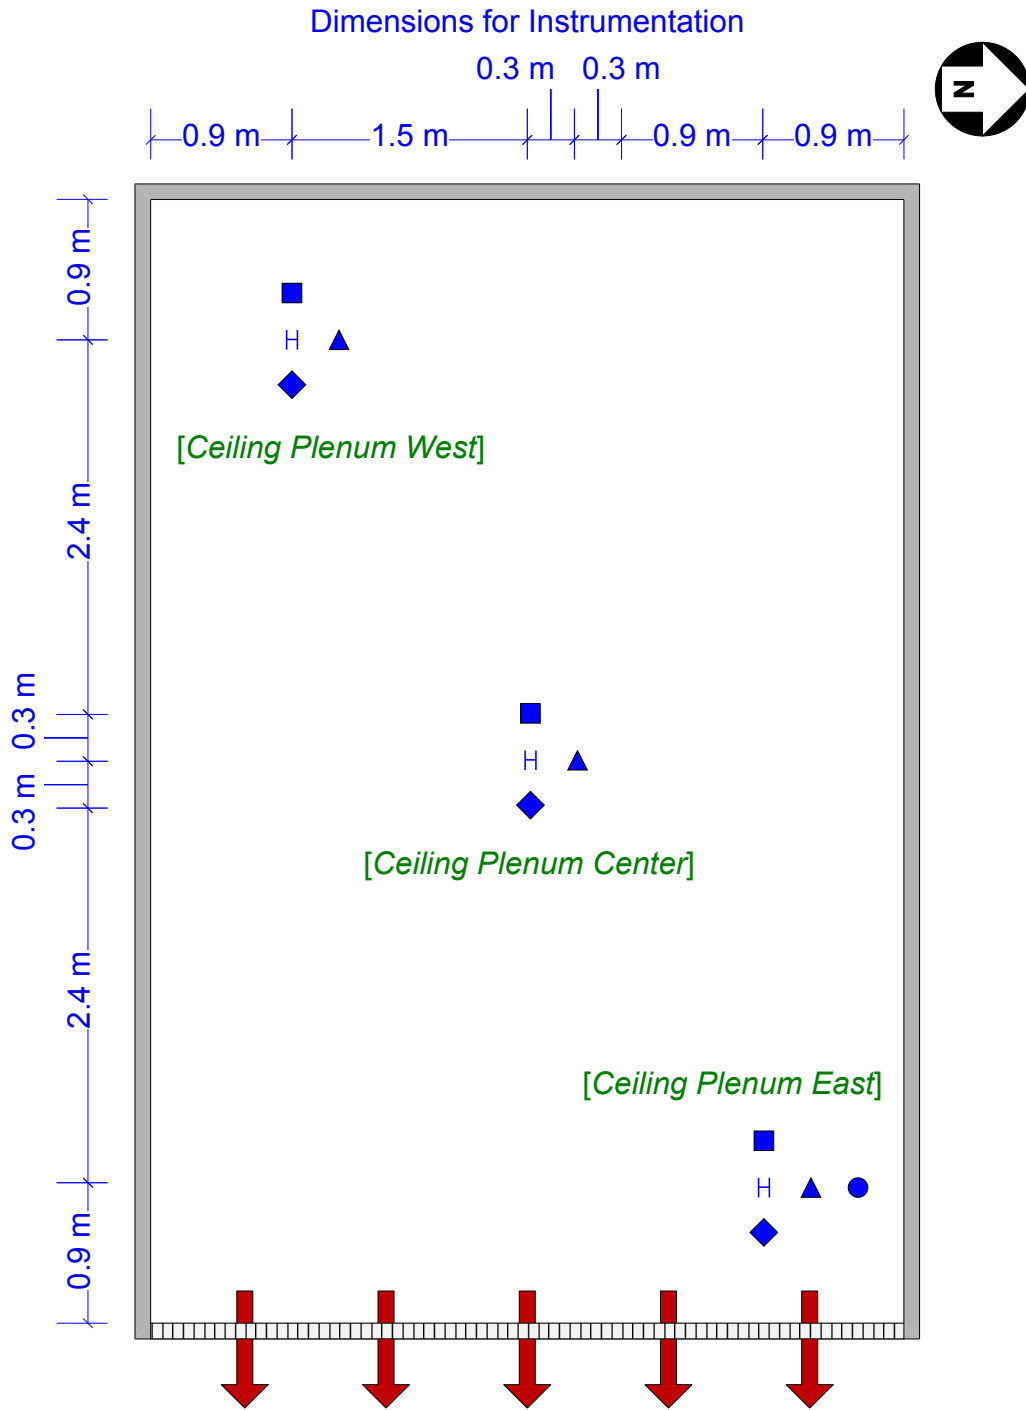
Plan view of the instrumentation and airflow direction at Segment C-C of Figure 2-2 and Figure 2-3 (suspended ceiling) in the ceiling plenum.
